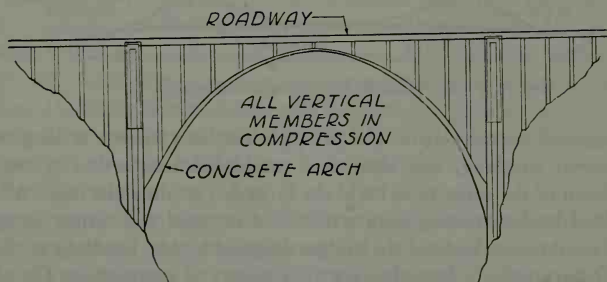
Bridge supported by a modern arch of ferroconcrete.
